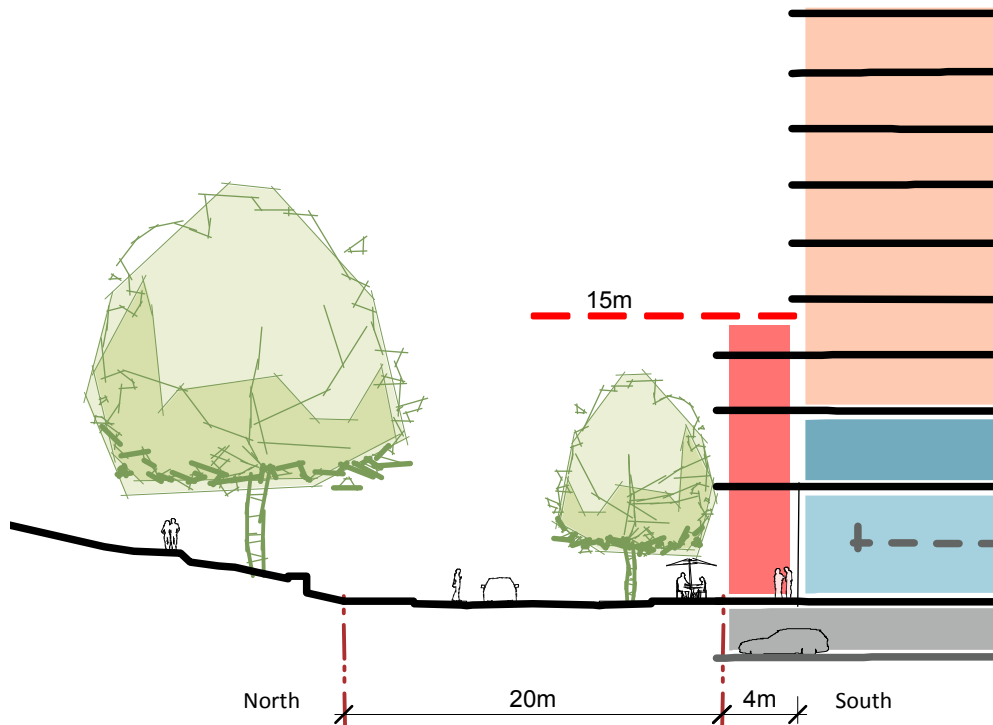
Building envelope control section 10 – the cross street north at the hill park
